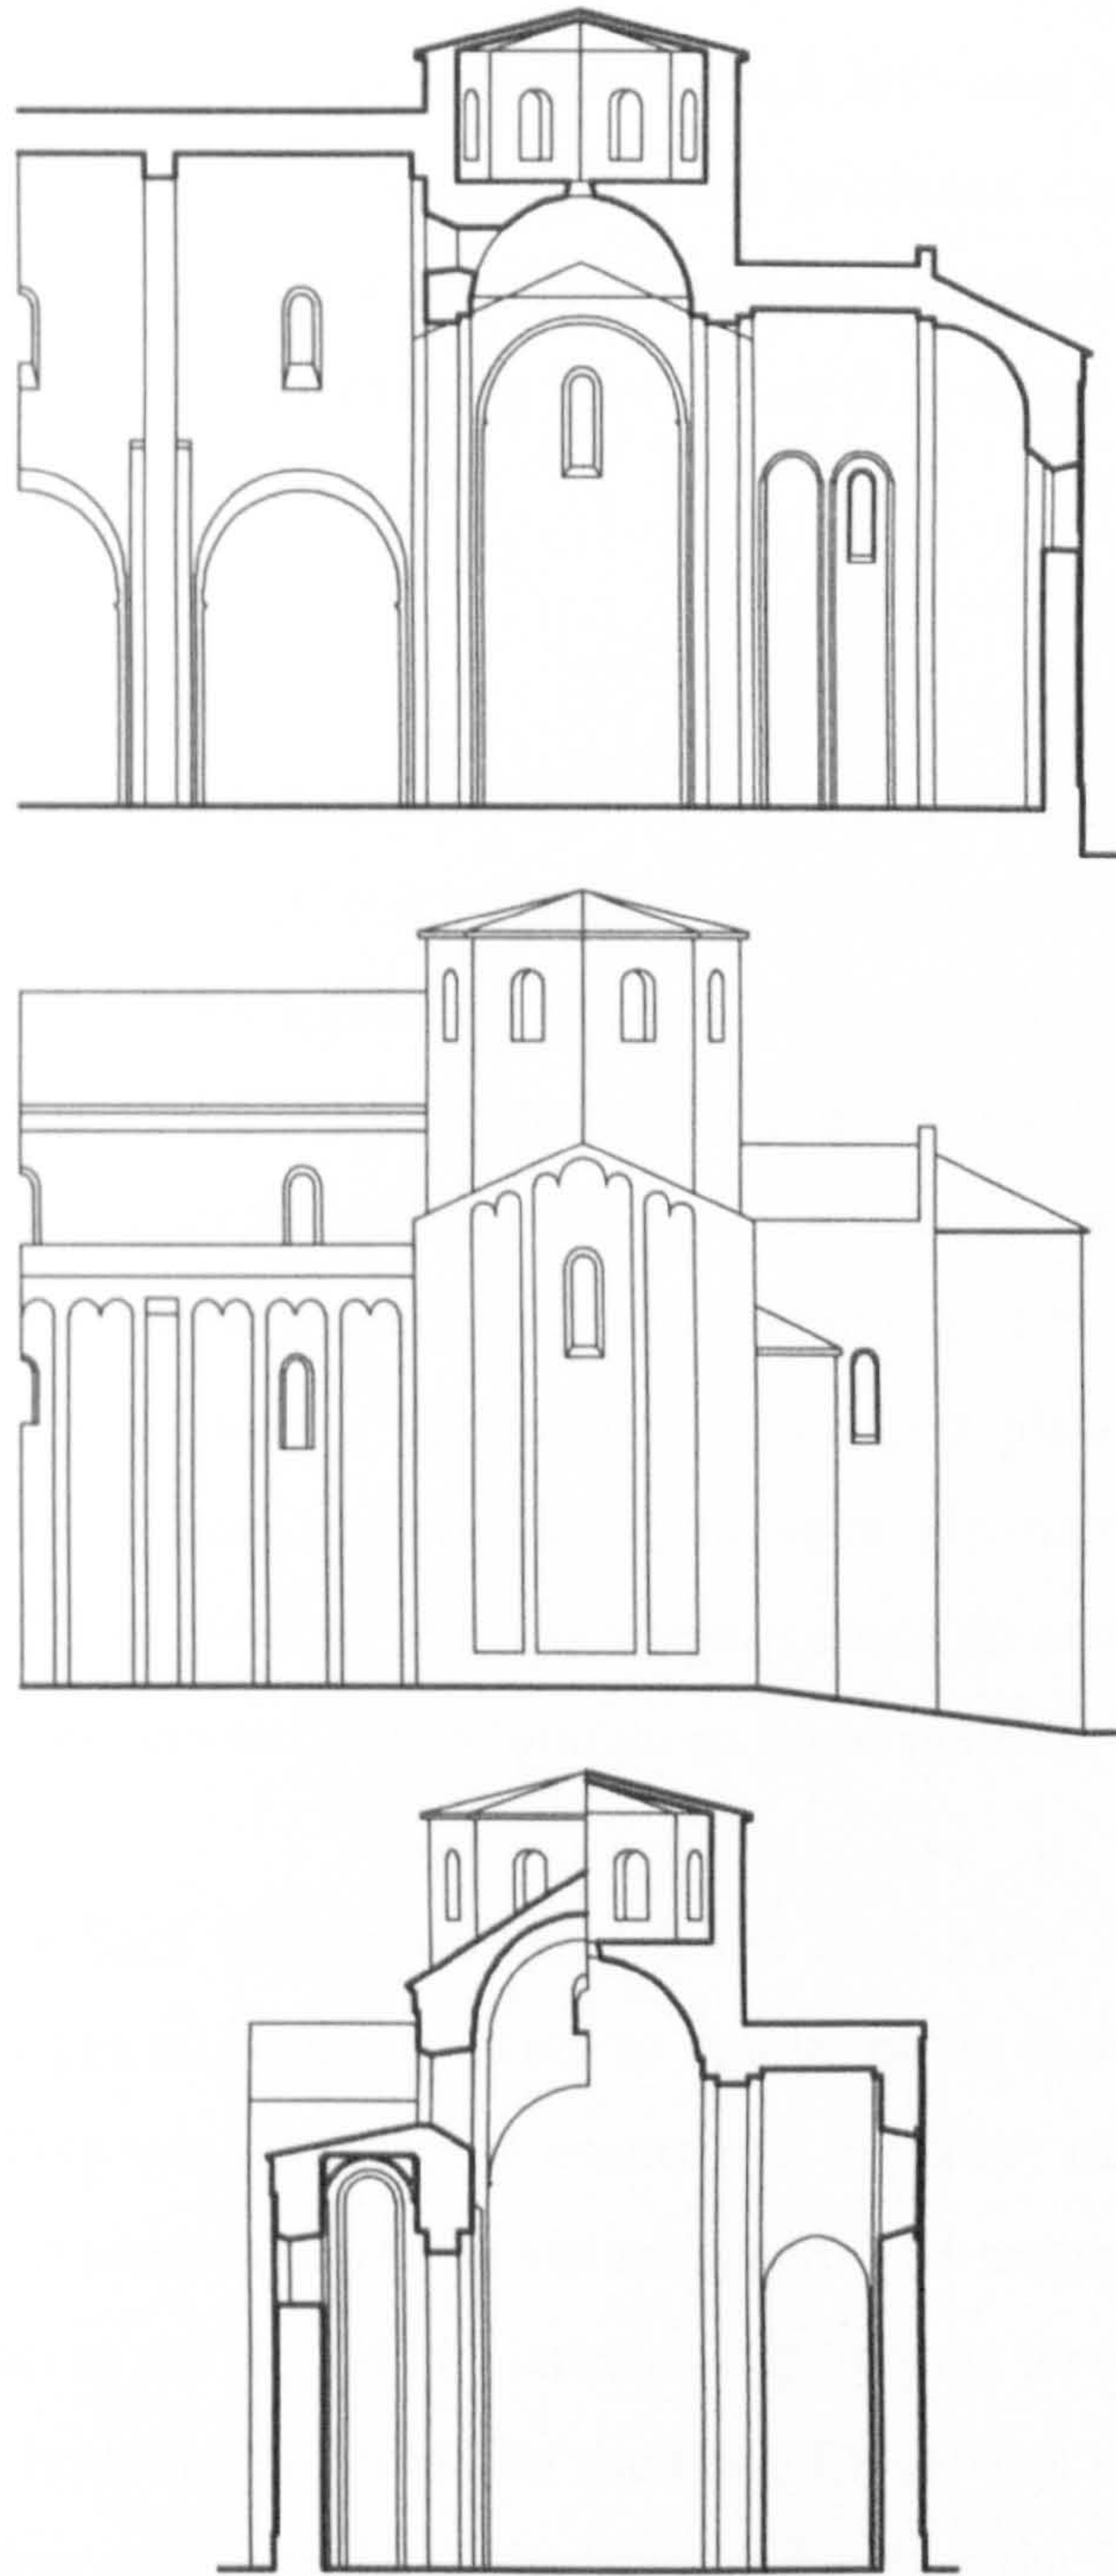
CAD sections and elevations of Sant Vicenç de Cardona, long section (top), south elevation (middle) and cross sections (bottom)
